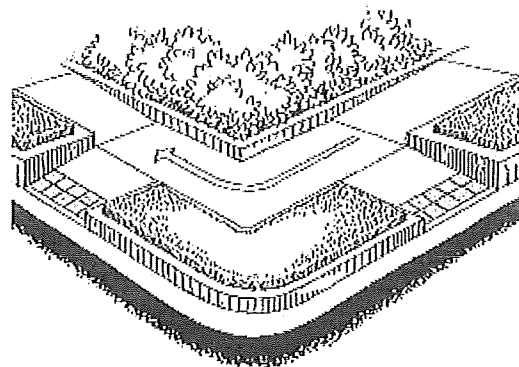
Combined parallel and perpendicular curb ramps lowers the elevation of level landings while bridging the remaining elevation gap. This recommended design is very accessible but can be expensive to install in some retrofit installations.
